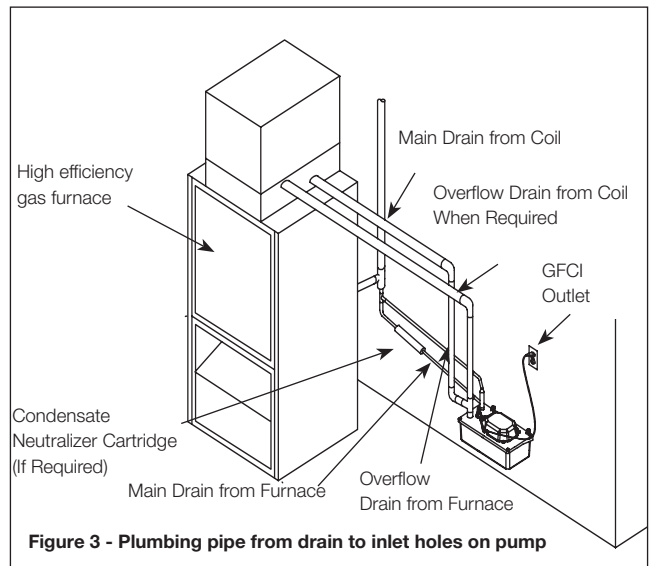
Plumbing pipe from drain to inlet holes on pump
